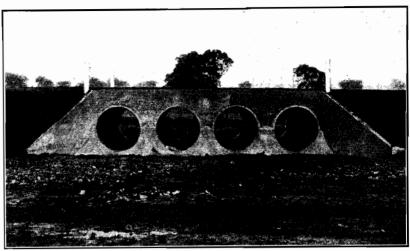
Quadruple pipe culvert erected on the Upper Goulburn Road in the Shire of Alexandra.
